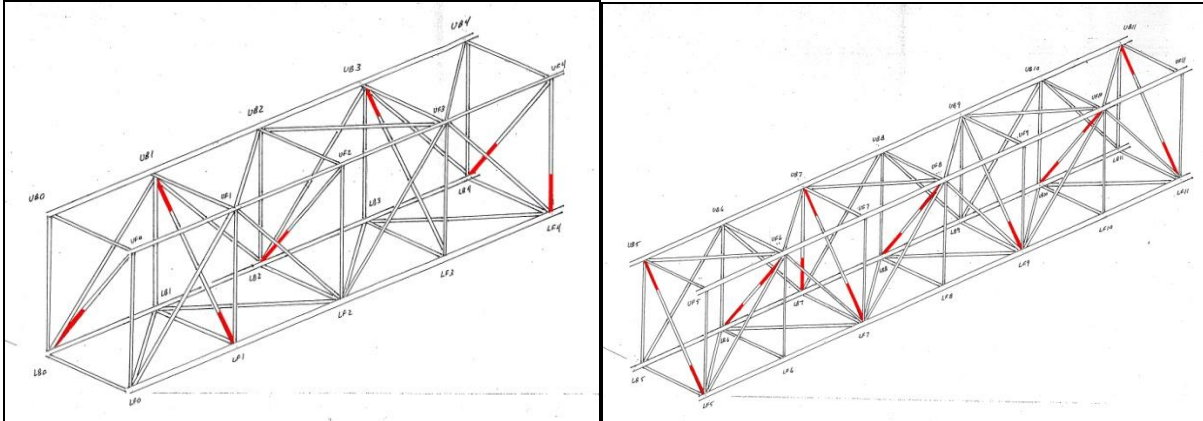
Crack locations on typical truss structures (Brakke, 2007)
